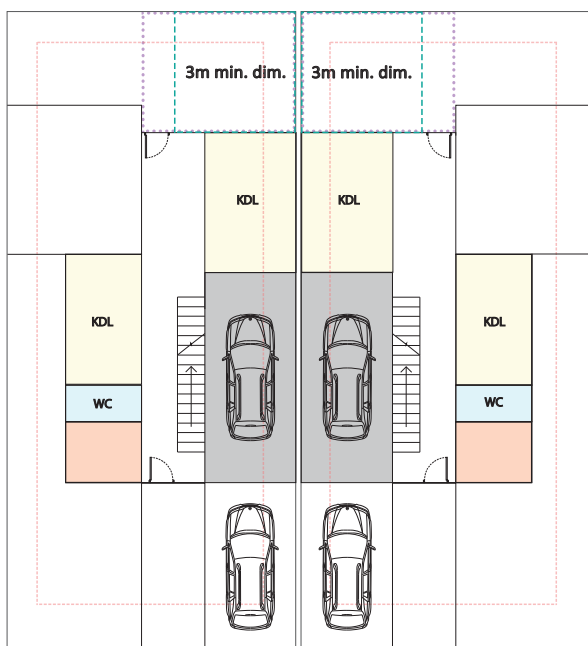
Floor plans for type EOT2 - Refer fig 66.67 (page 58) for further details
